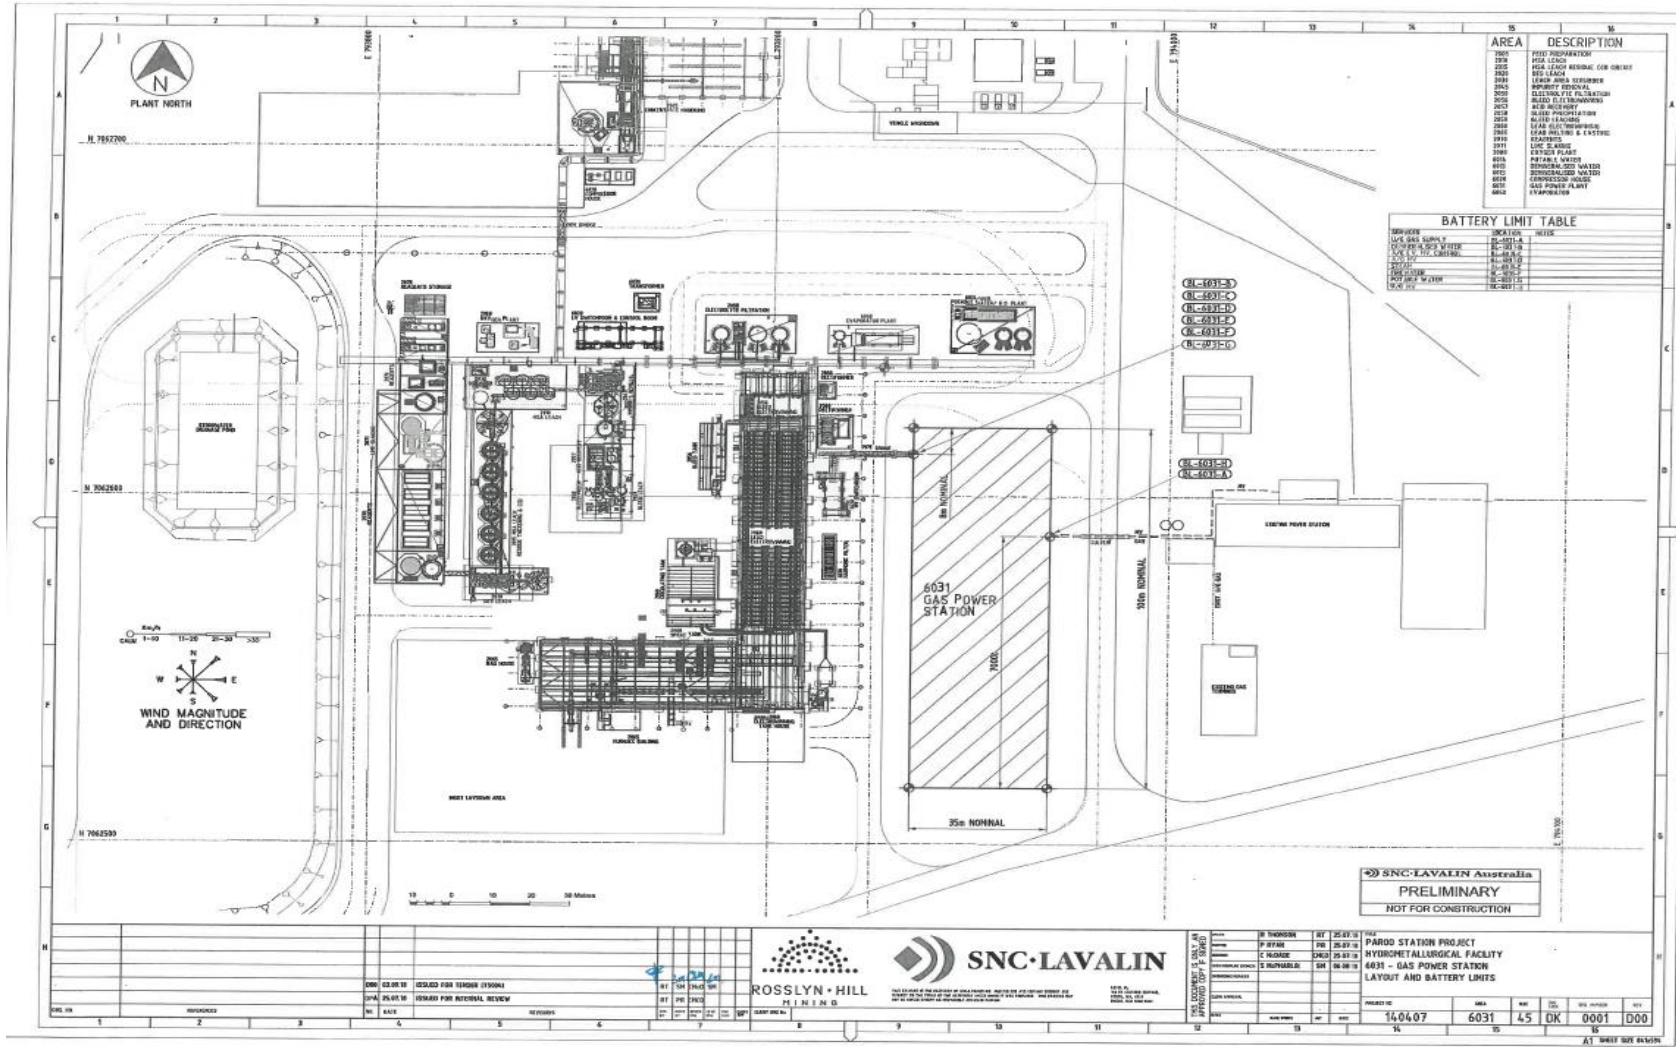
Hydrometallurgical Facility and Gas Power Station Site Layout
